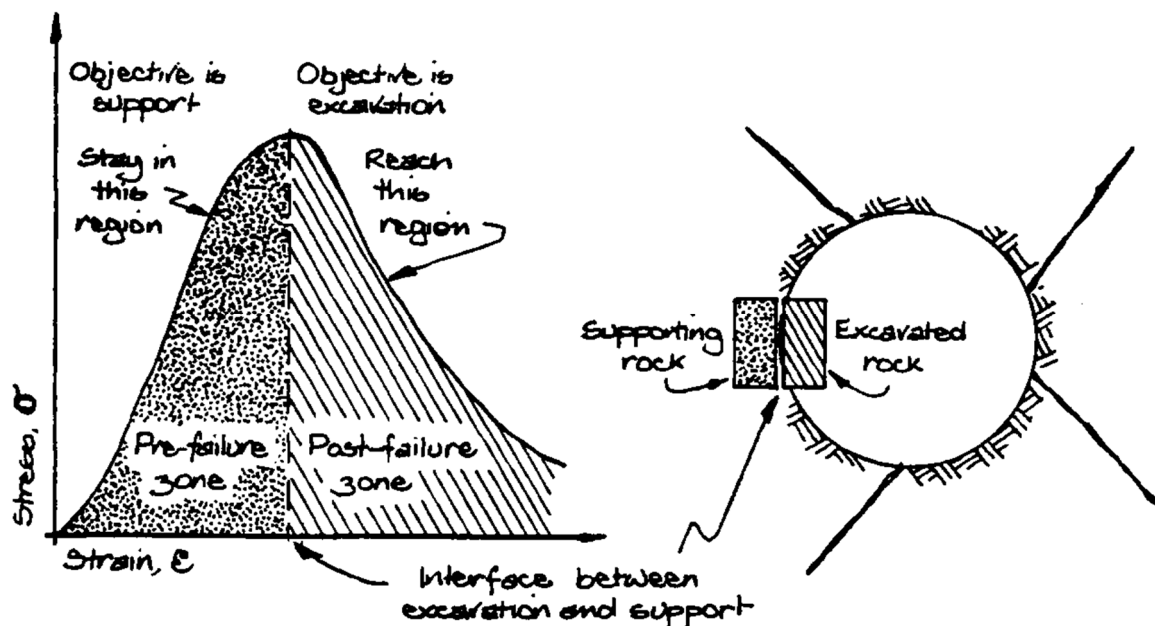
Behavior of Rock in Tunnel Excavation (Source: Neil Benson)
